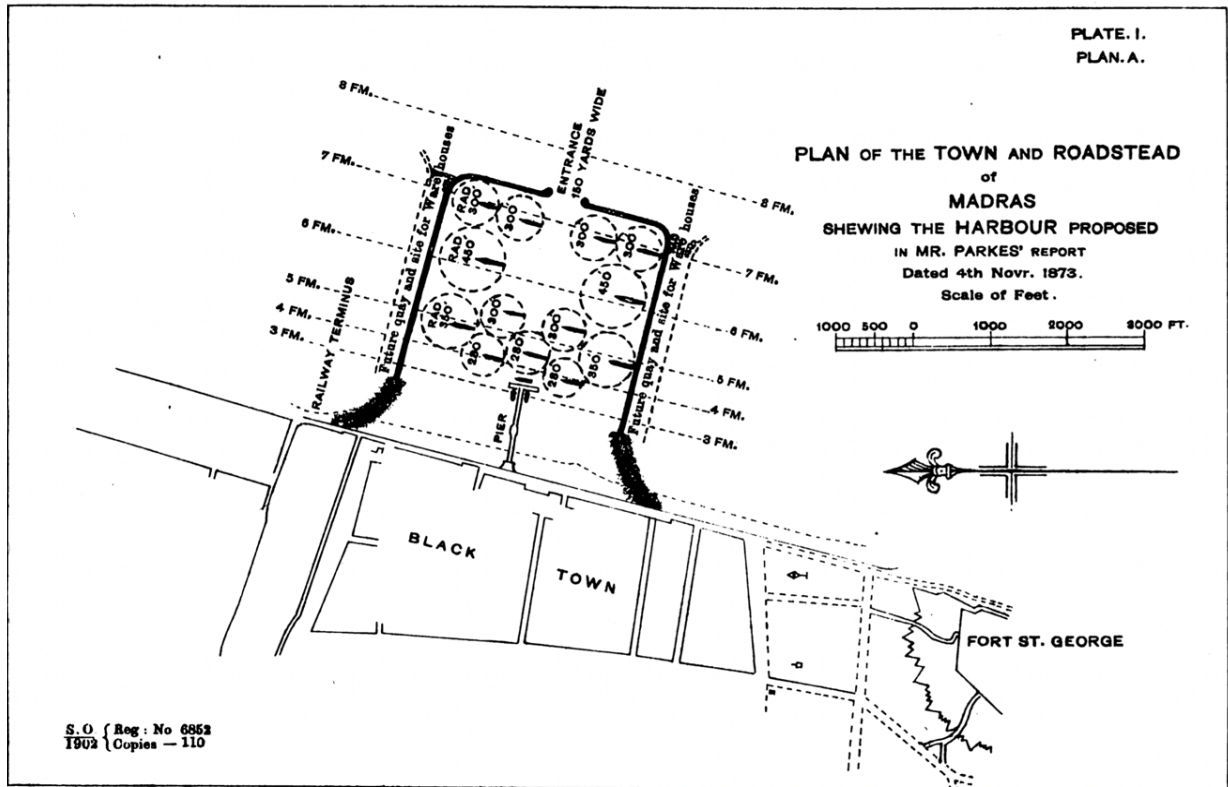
Parkes's original harbour plan, showing the existing pier and room for thirteen ships to swing at anchor. McKenzie, *Official Papers Concerning the Construction of the Madras Harbour*, Plate I.
